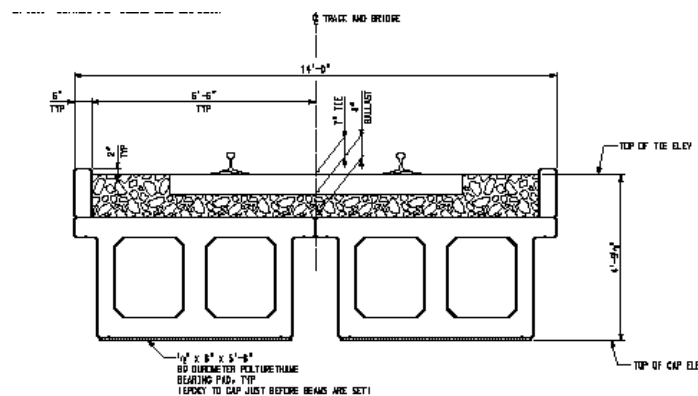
Cross section of proposed standard precast prestressed concrete span
